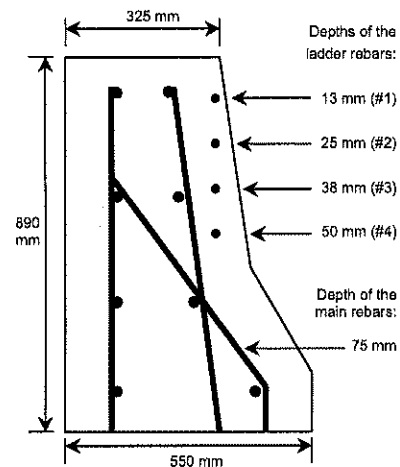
Cross-section of barrier wall showing the main reinforcement with transverse bars spaced at 230 mm, and a test rebar ladder to the right.
